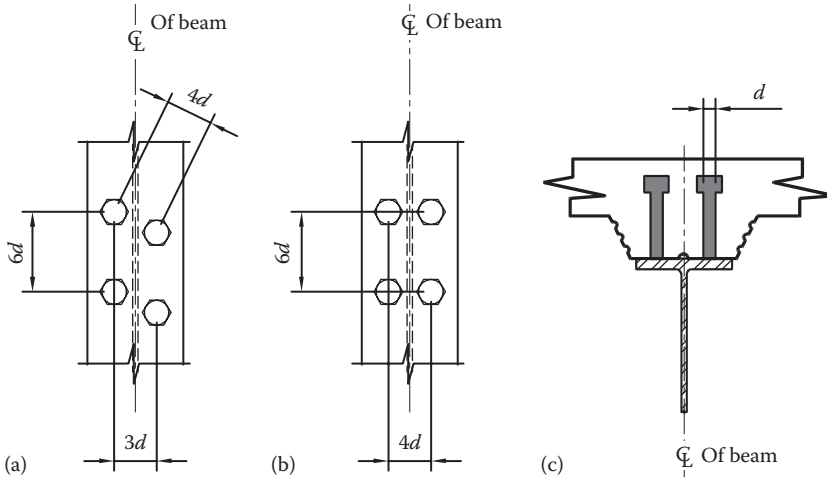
Shear connector arrangements: (a and b) plans; (c) section.
